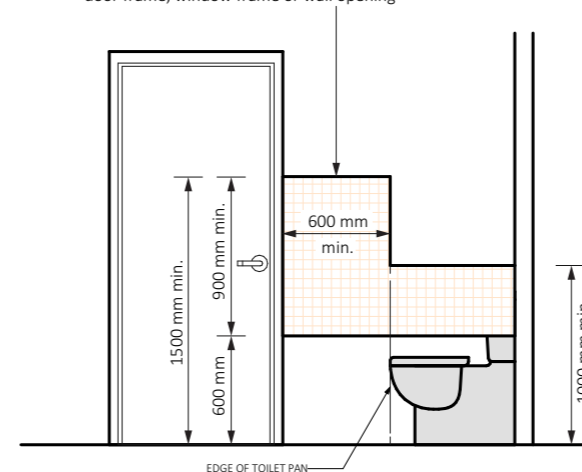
Minimum extent of sheeting for wall adjacent to a toilet pan
